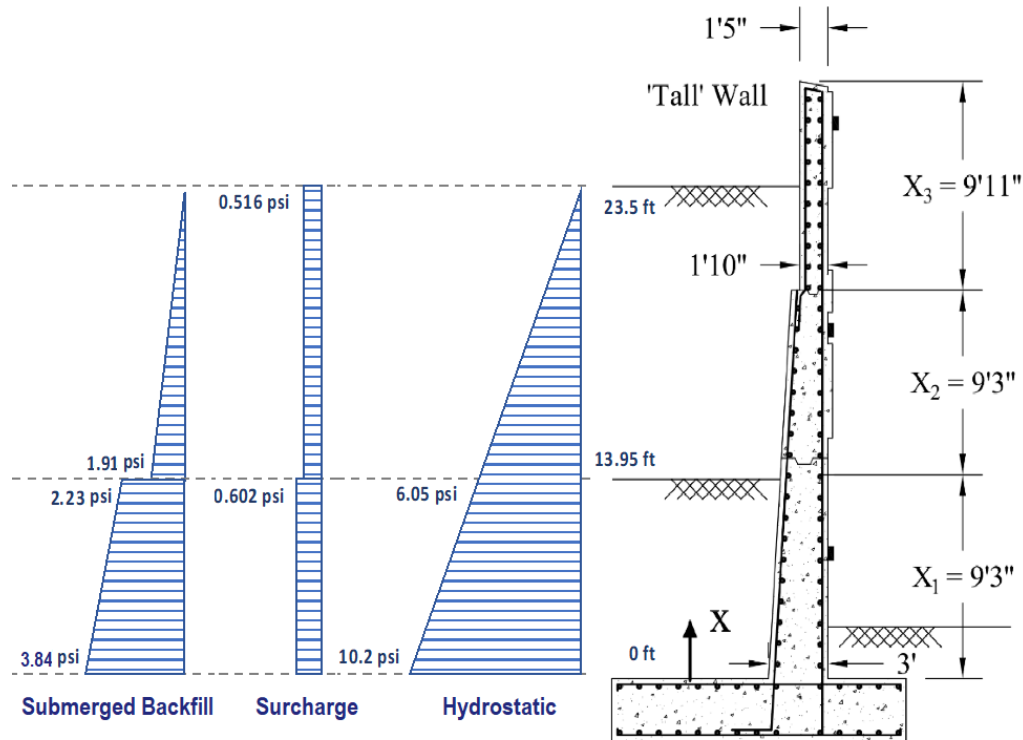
Lateral earth pressures on tall I-696 wall: backfill, surcharge, hydrostatic
